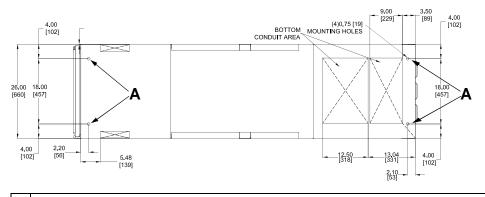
Holes for Anchoring the Switchgear to the Floor
